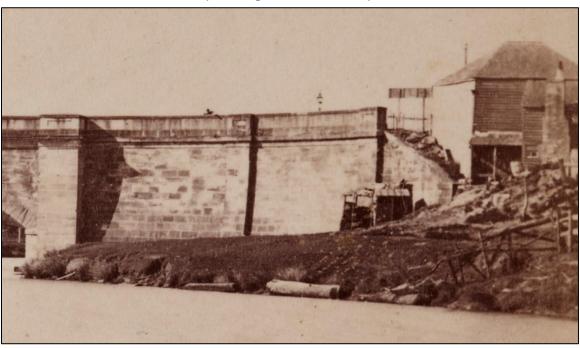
Detail of an undated view of Lennox Bridge from the west. To the right of the bridge are the buildings occupying the eastern side of Allotment 1A (Items 7, 10 and 48). At the extreme right is a three storey building of unknown function (Item 47) (from AHMS 2011:119)
